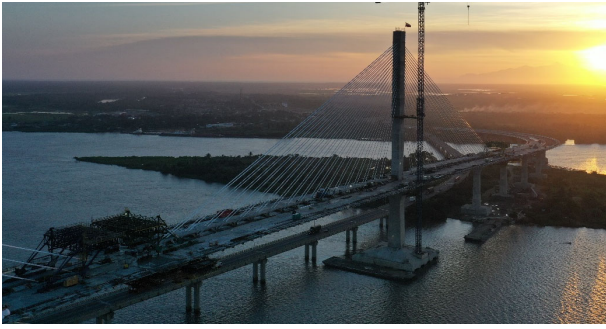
View of the P13 pylon during the execution of the cable-stayed section
